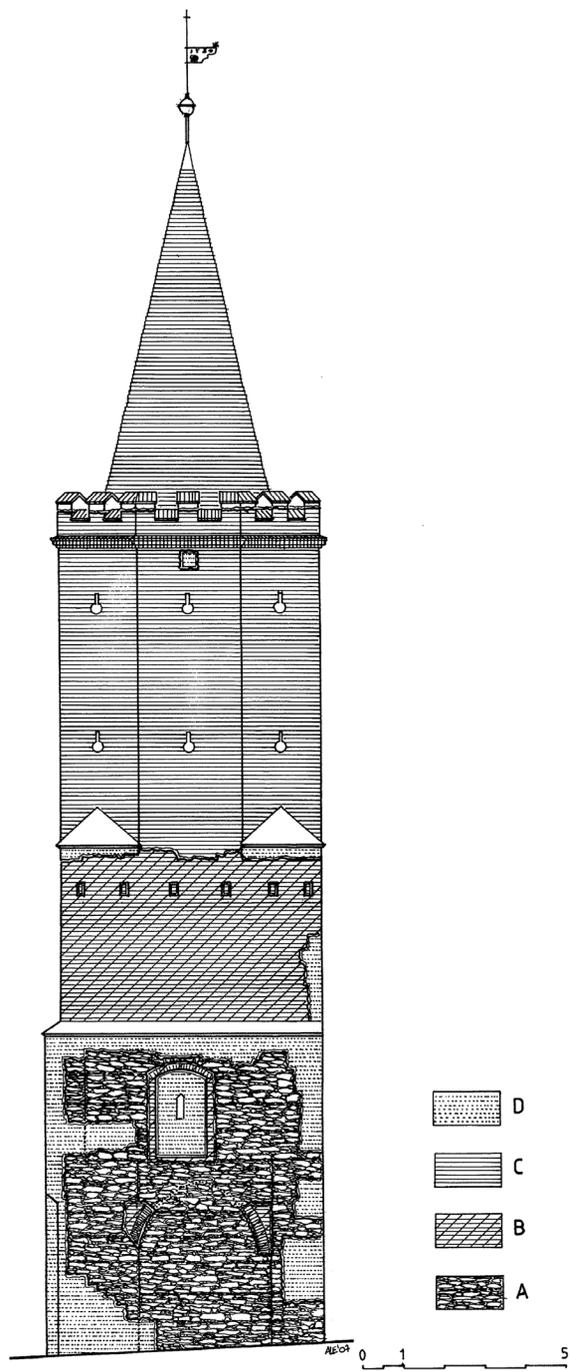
Prudnik, Dolna Gate's tower, north elevation with chronological wall stratification.
